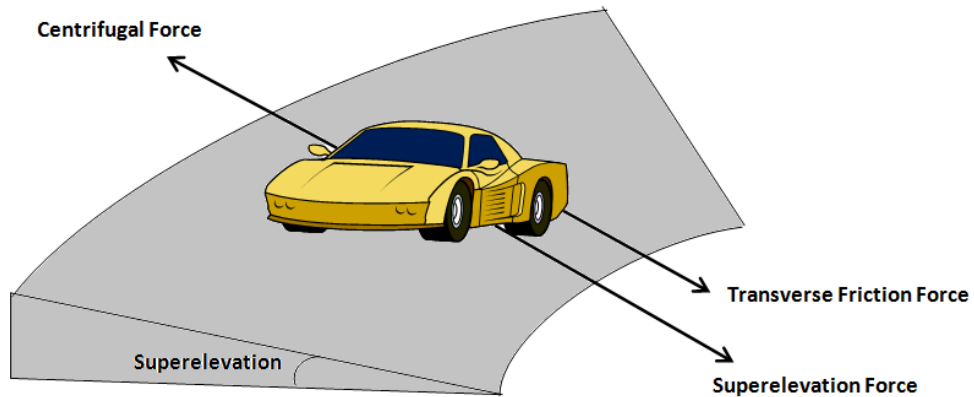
Superelevation on horizontal curve to counteract centrifugal forces
